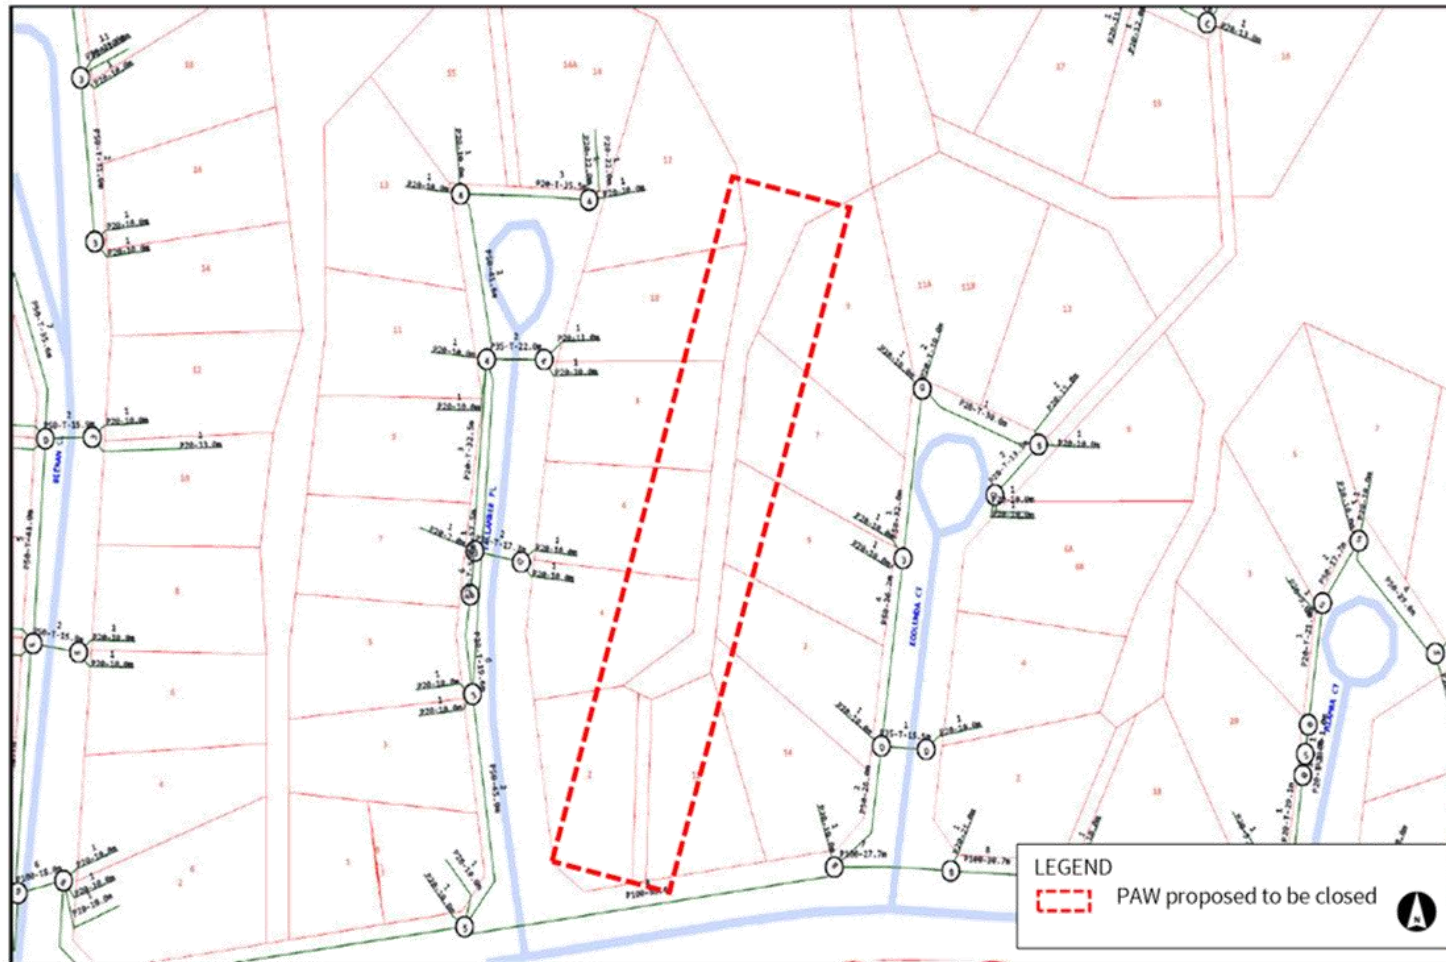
NBN Co Asset Locality Plan (Issued 9/02/2021)
